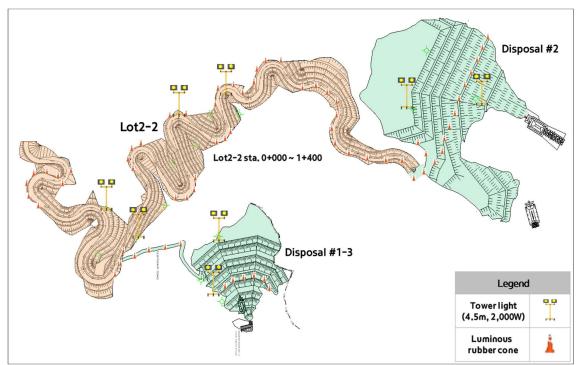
Location of Tower Lights and Luminous Rubber Cone at Lot 2-2 and Disposal #2(Stage 1) and #1-3(Stage 1)3
